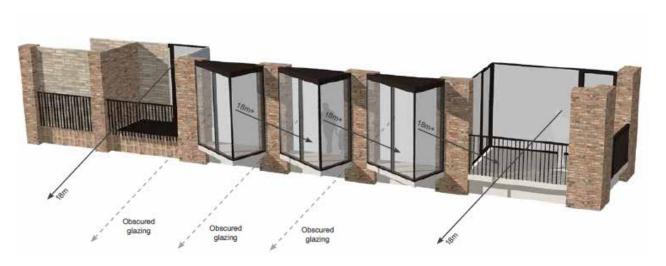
of proposed splayed windows for south elevation of proposal. Inset balconies are also shown.
